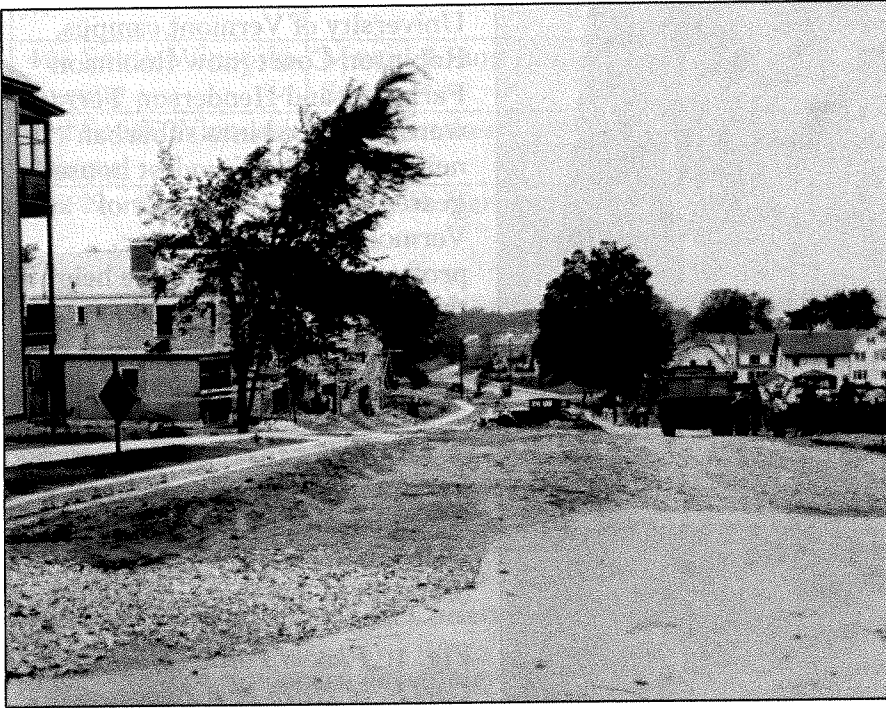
Construction on Locust Street, with Five Sisters neighborhood in background (undated)
